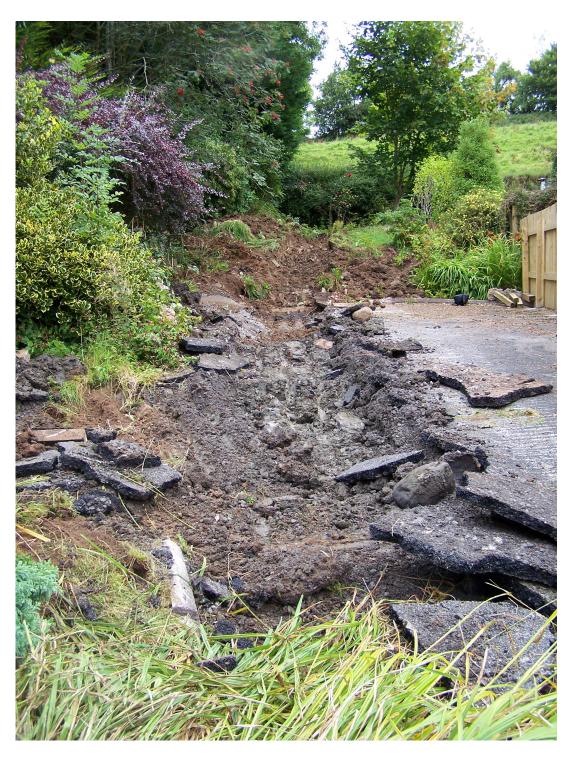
General shot of the proposed development site showing the concrete and tarmacadam covering to the SW area of the test trench area. Looking NE.
